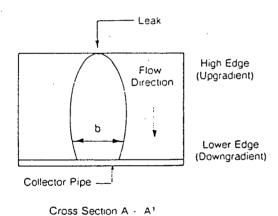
Plan view of a leak detection system with a large leak flowing over a width b.
